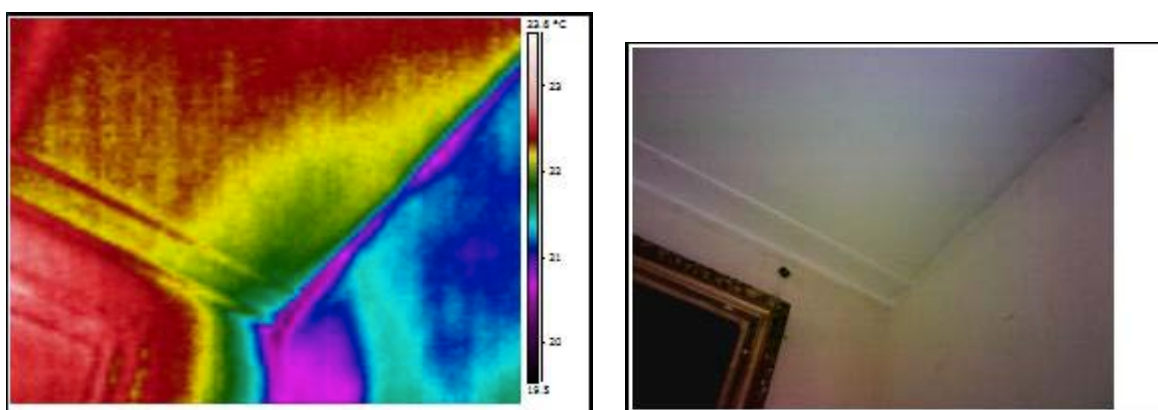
Room F18. Well insulated roof and poor insulated external wall.
